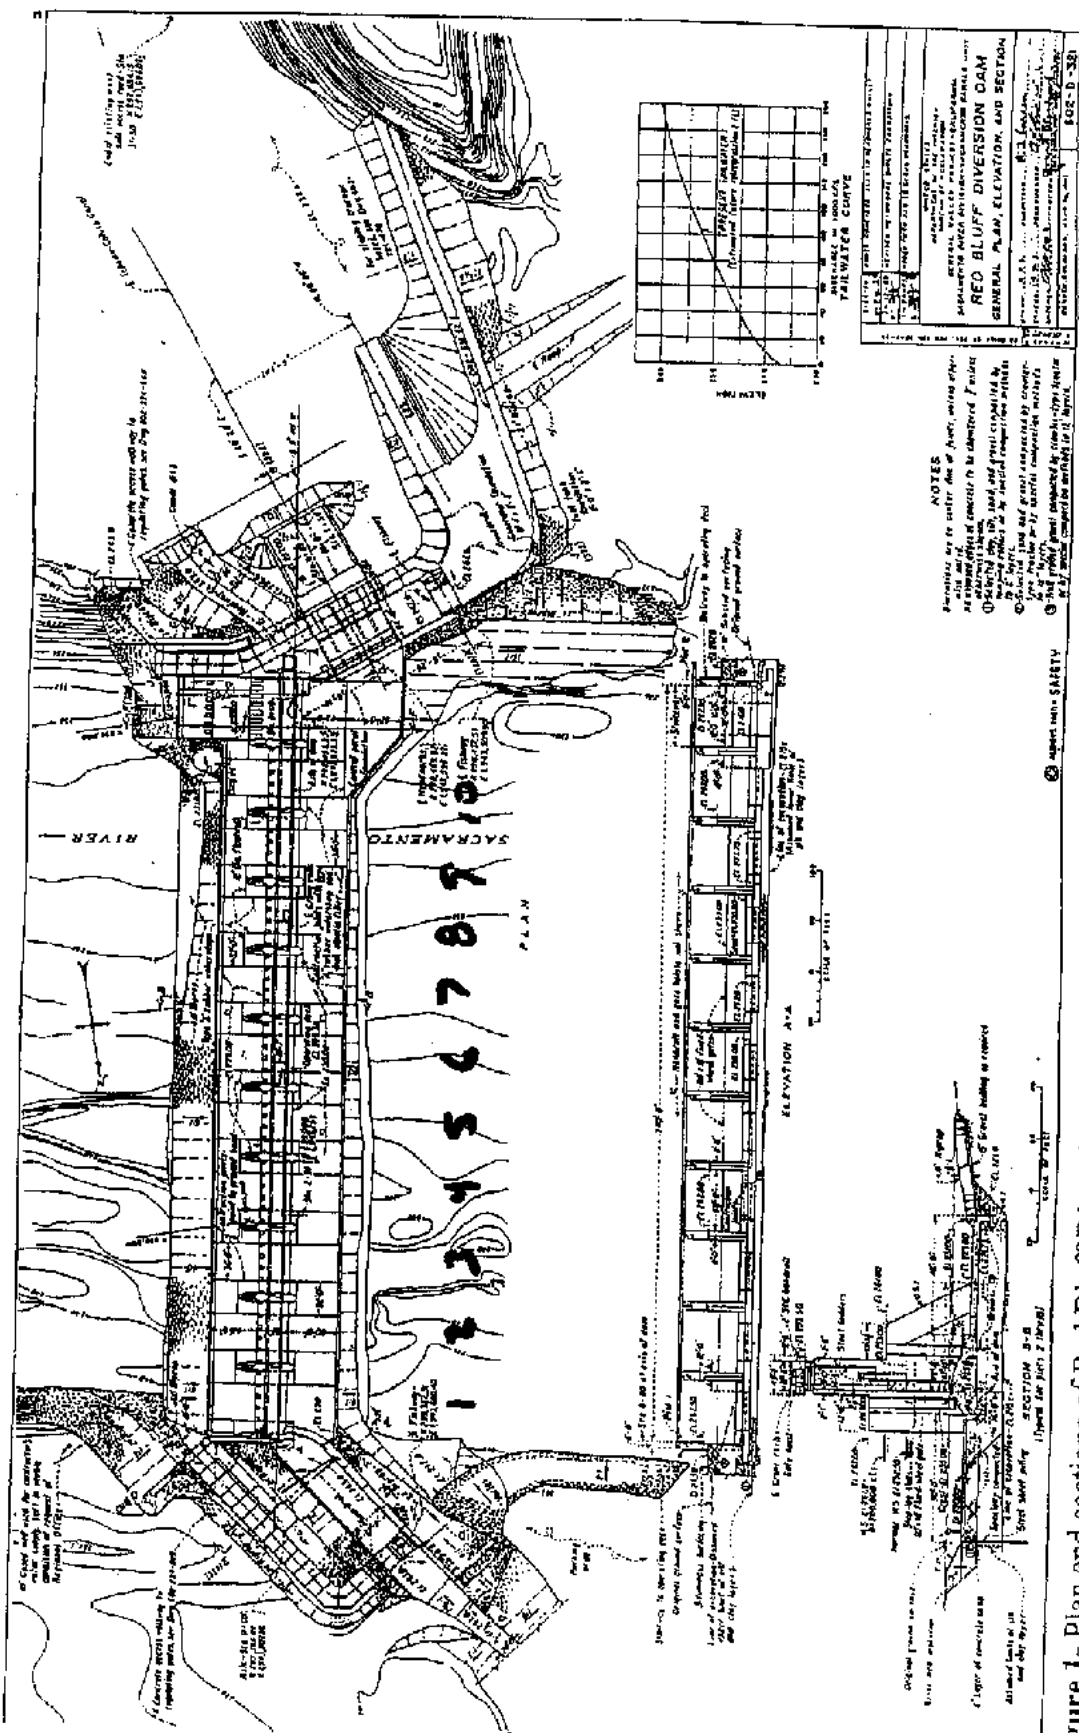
Plan and sections of Red Bluff Diversion Dam.
